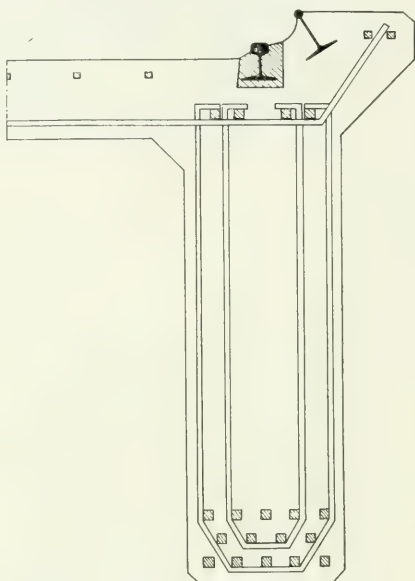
DIAGRAMATIC CROSS-SECTION OF 75 FT. GIRDER
